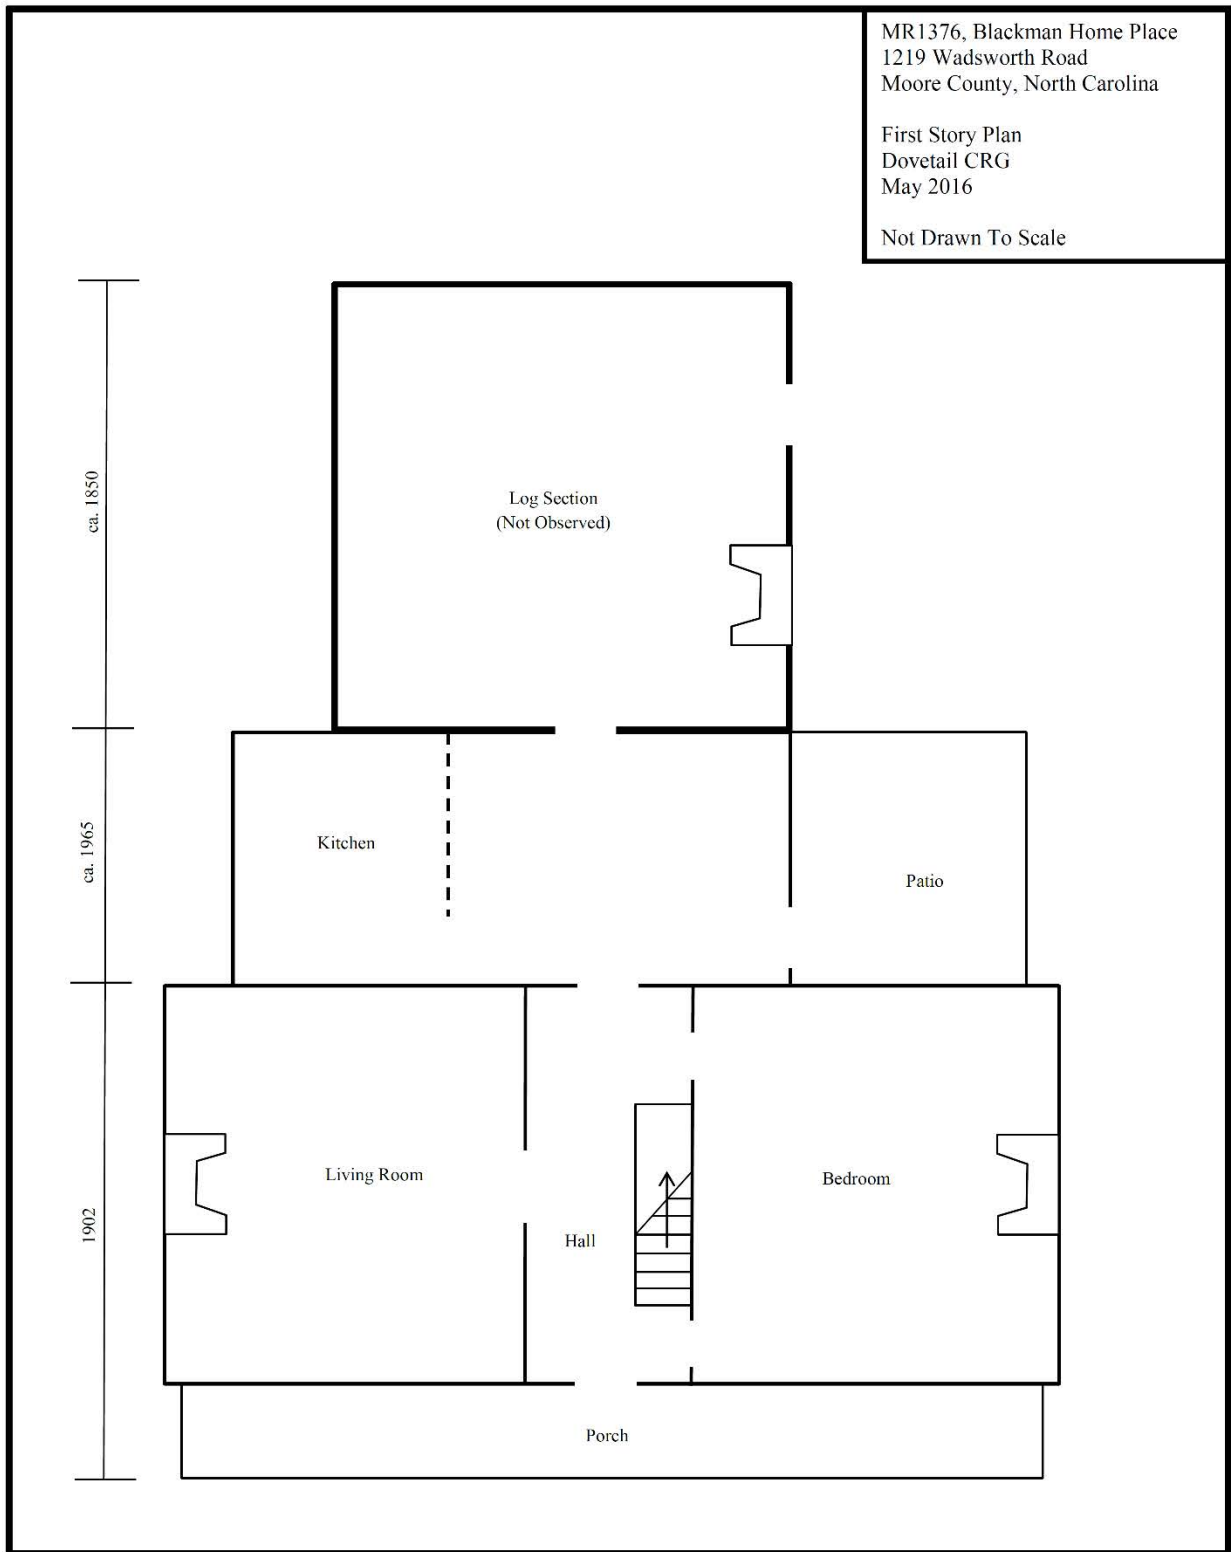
First-Story Floor Plan of the Blackman Home Place (MR1376).
